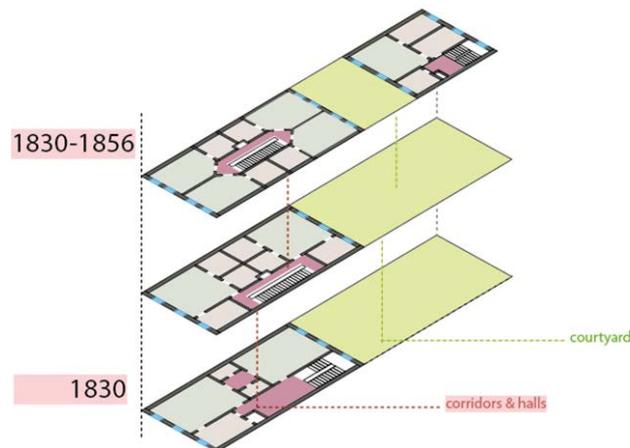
The Change in Tenement House Plans in Lower East Side, New York, 1830-1856 (adapted by authors - URL-19)
